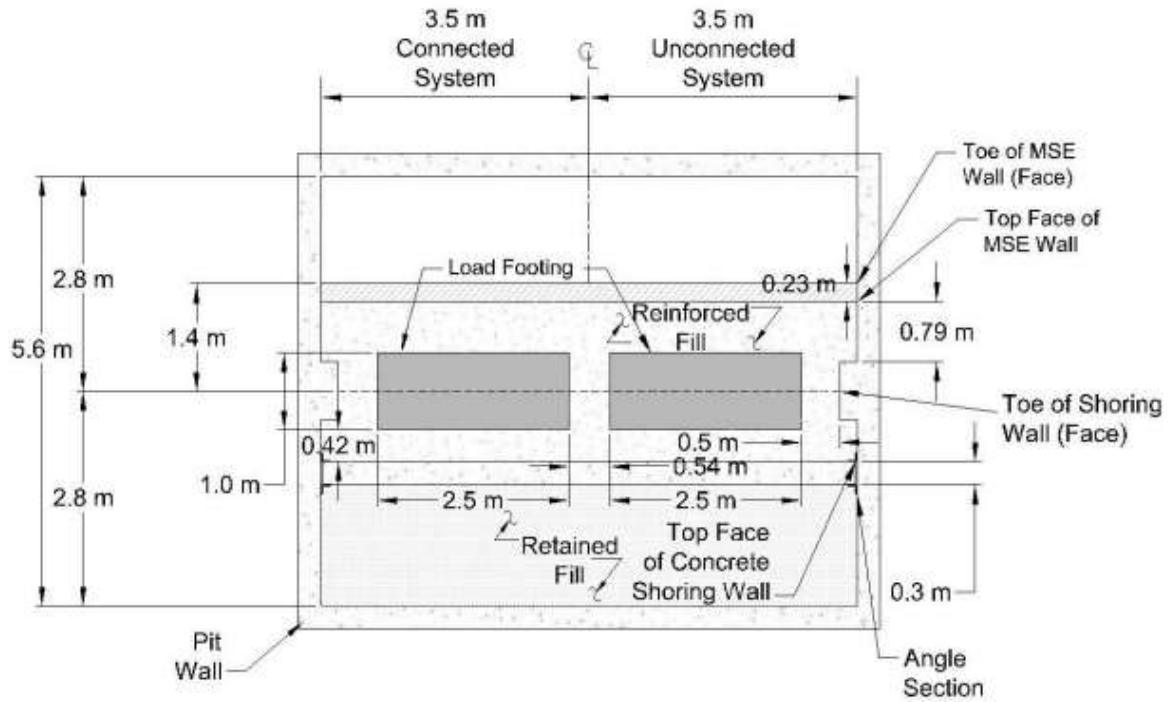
Test wall plan view (FHWA – Turner Fairbanks Highway Research Center (TFHRC))
